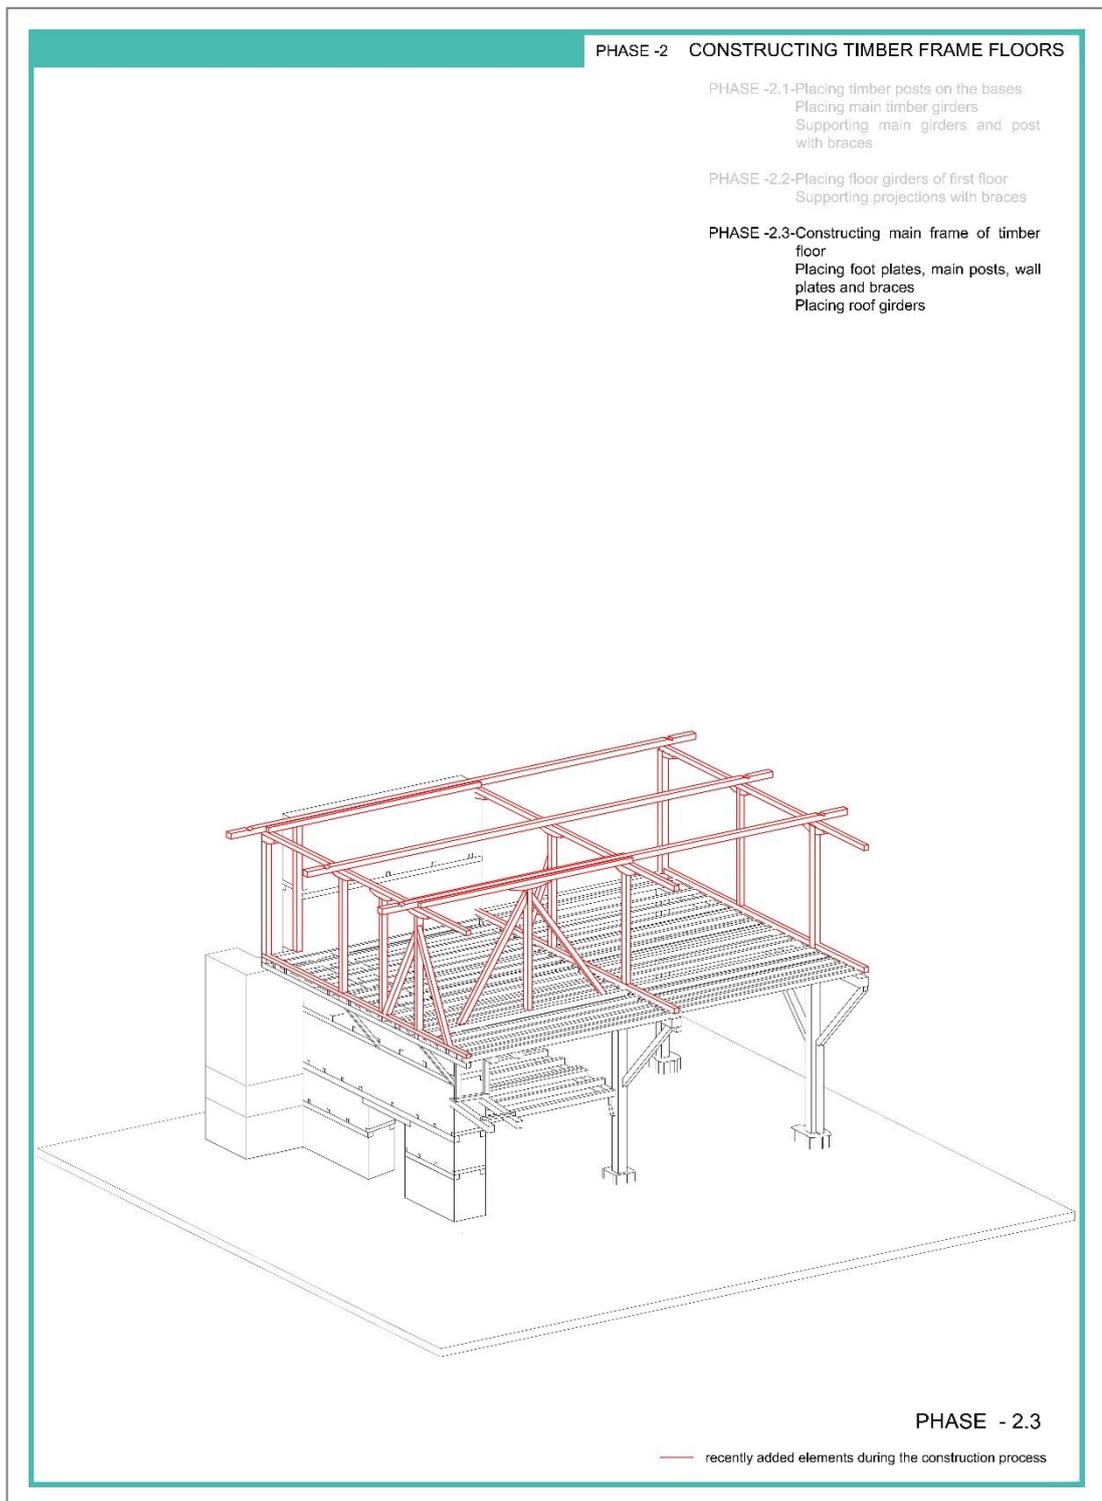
Phase 2.3. - Constructing timber frame floors
